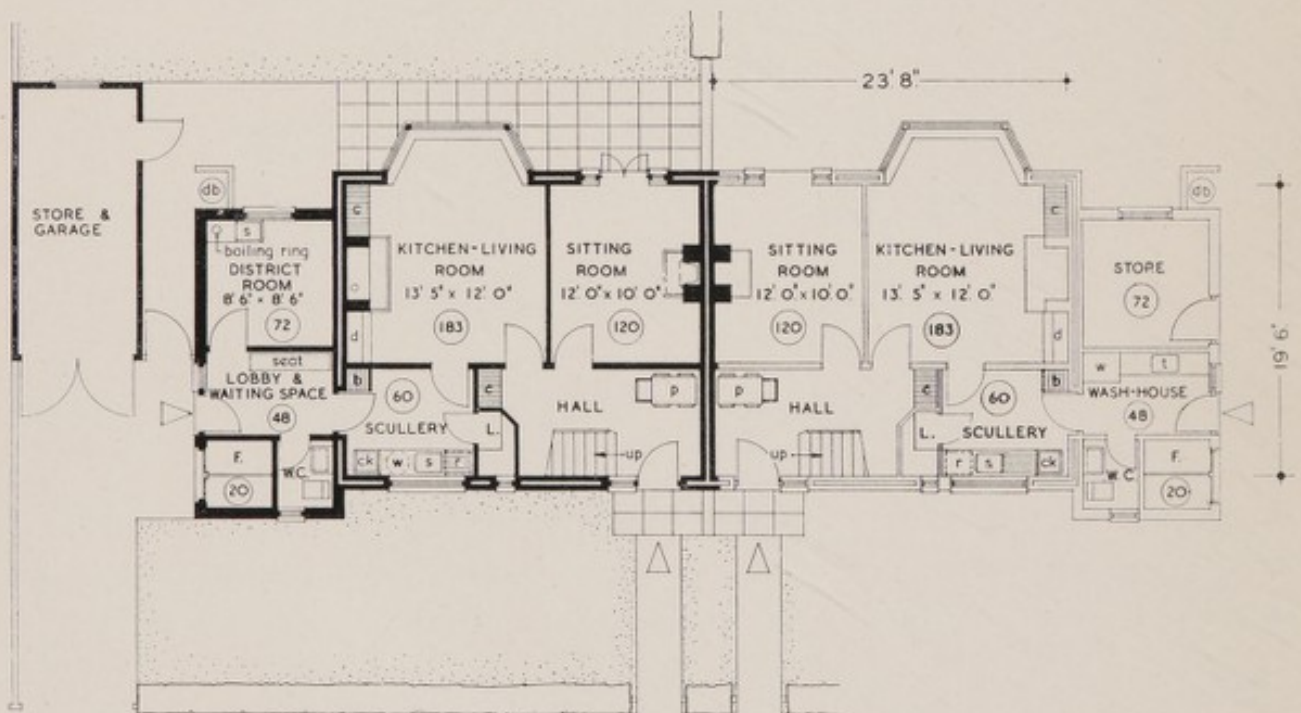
Plan of a bungalow at Kytes Green, Watford
